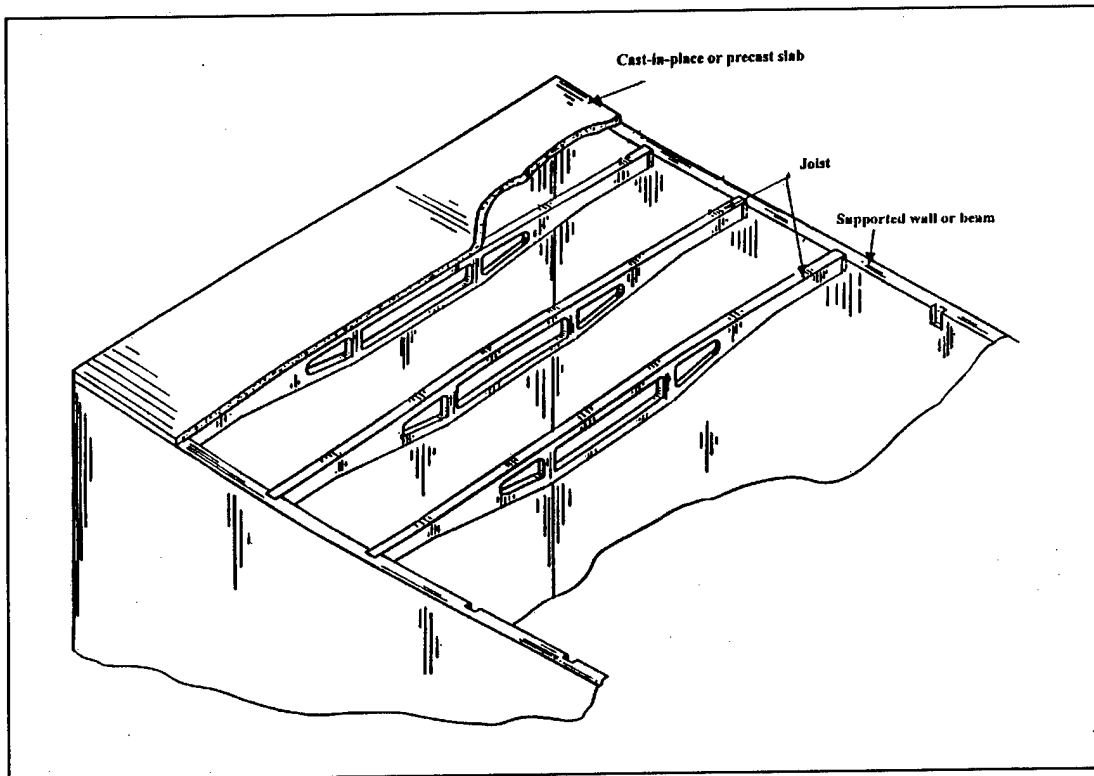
Cutaway view of hybrid joist system supporting a concrete slab.
